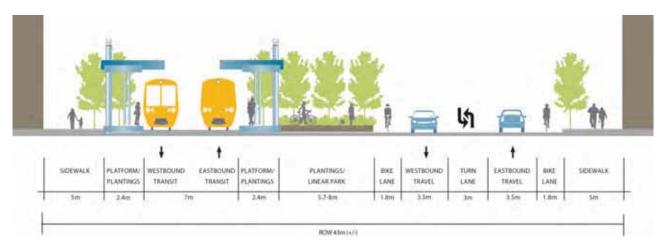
Cross-section for Villiers Street Alternative 1 (facing east)
